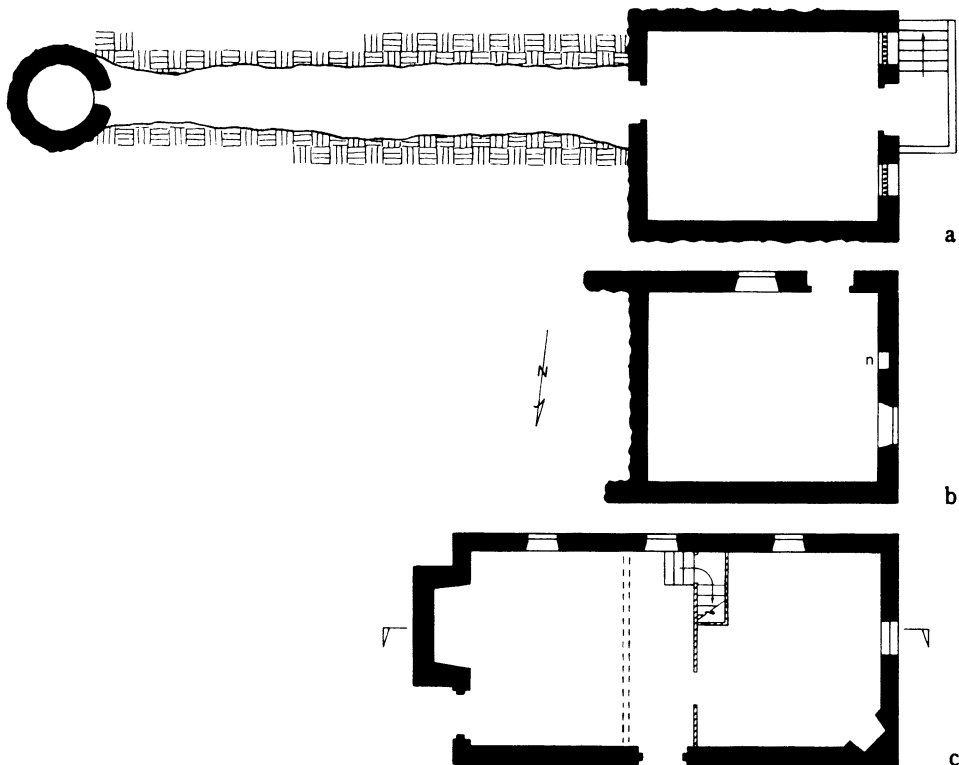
Fort Philip Long. Cellar and first-floor plans.
